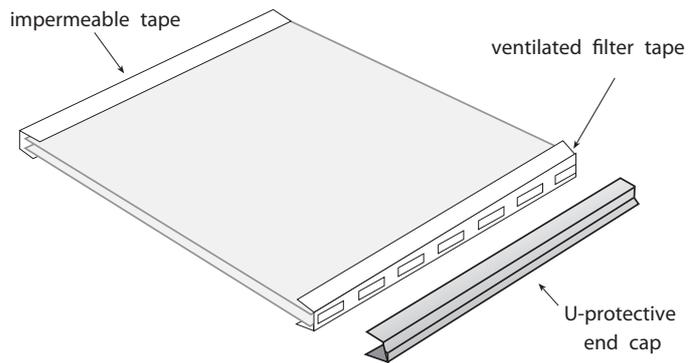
Installation of Impermeable Tape at Top of the Sheet and Installation of Ventilating Tape at the Bottom of the Sheet
